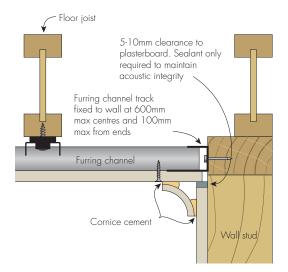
Ceiling to Wall Resilient mount and furring channel
